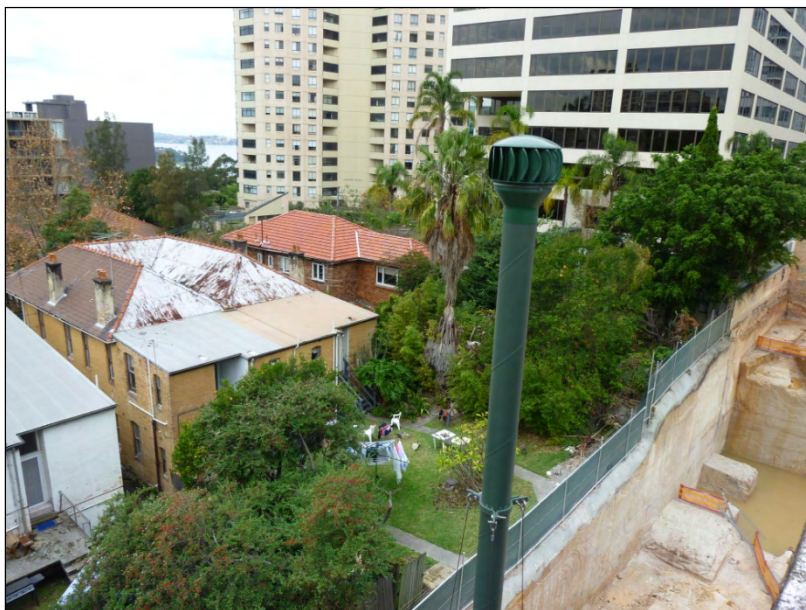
View of the Proposed Substation and Existing Substation Sites in the Foreground Surrounded by North Sydney Development Looking South
